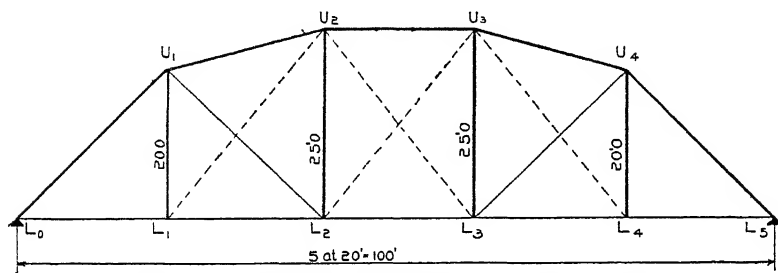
Outline Diagram of 5-Panel Bowstring Truss Span
